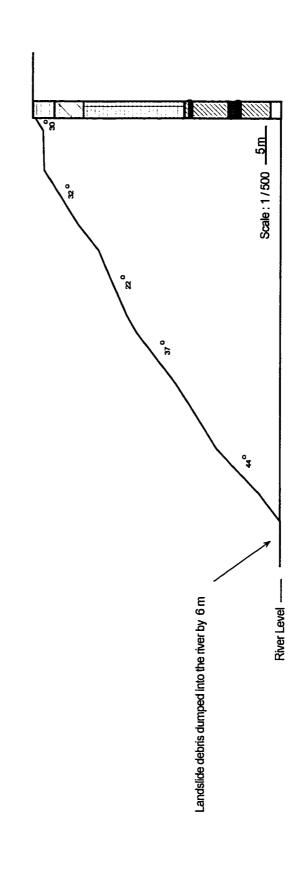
32 - Longitudinal Profile, P-32, at Loc. 32, (looking downstream)
